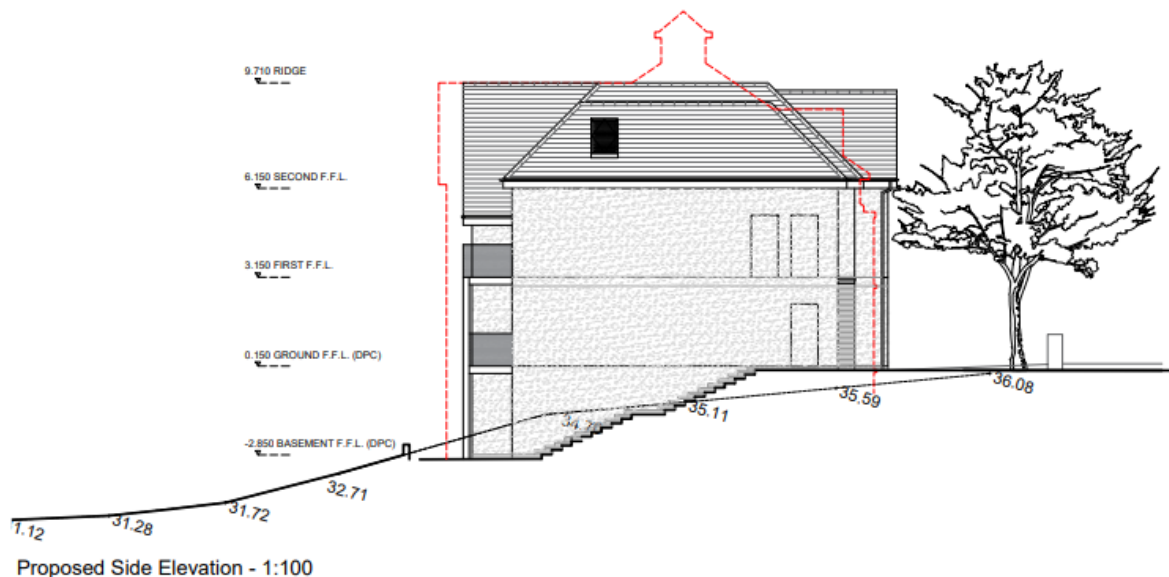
Proposed side elevation showing outline of existing building (dashed red line) and the proposed development.
